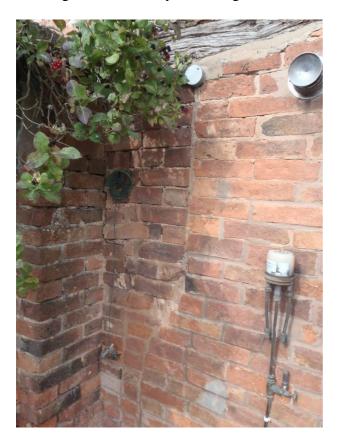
Detail of the edge of the blocked entrance showing how the garden wall, keyed into the rear wall of the main building was an integral part of the structure. It formed the southwest (long) wall of this removed portion of the building. Looking west
